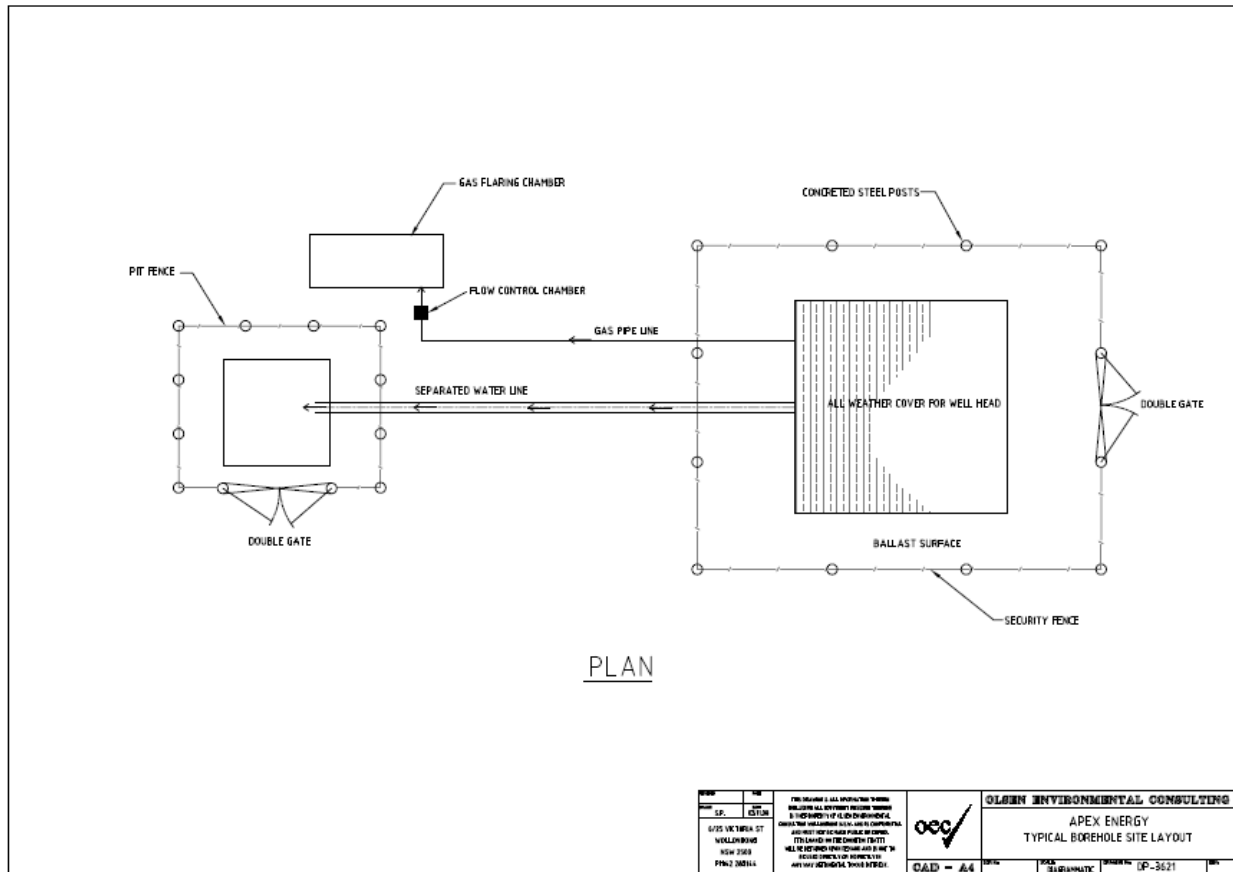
Typical Borehole Layout at the Completion of Drilling
